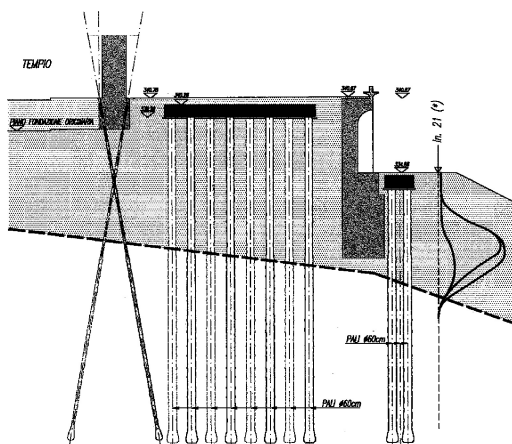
Small diameter piles on the foundations and front bulkheads with large diameter piles.
